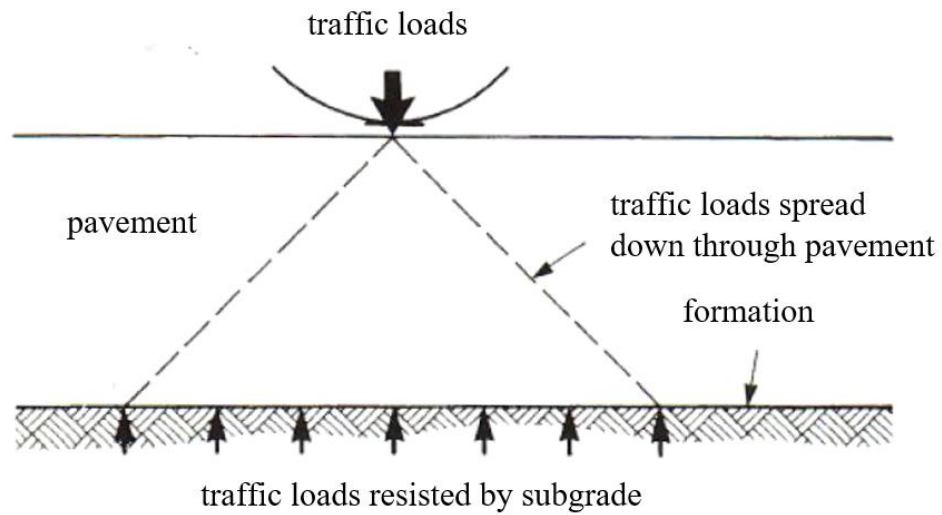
1 Distribution of load through the road pavement structure (Wignall et al., 1999)
